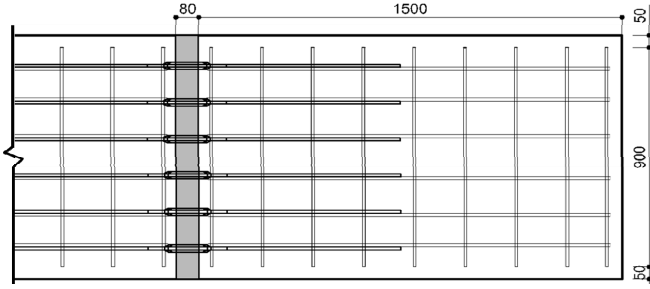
Reinforcing detail regarding connection between rebar and TBB
